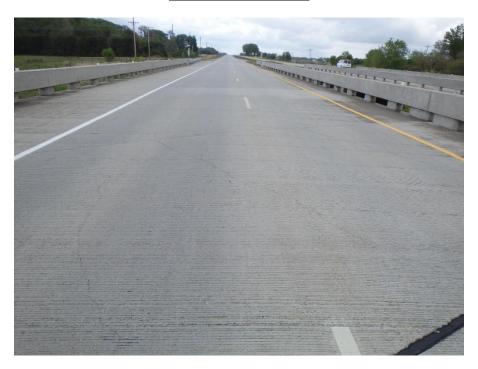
Turkey Creek bridge approach slab and paving section cracking
